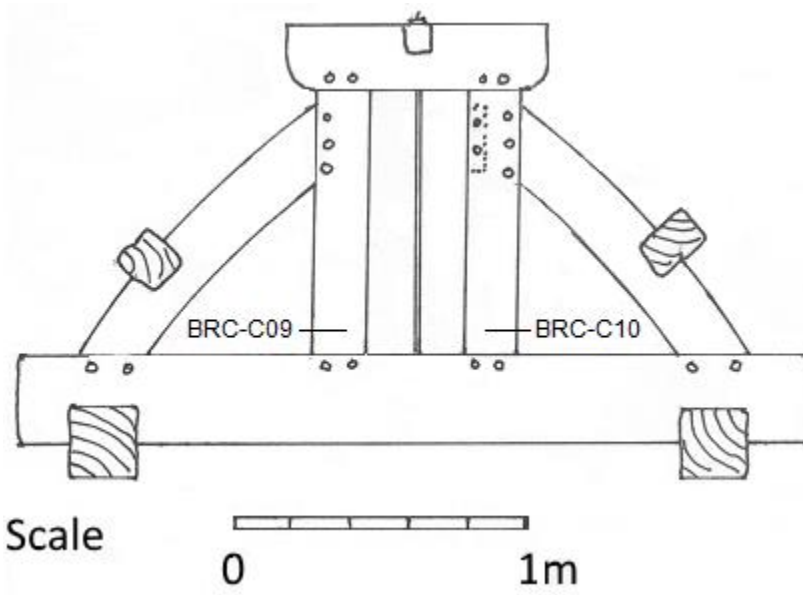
Truss A, showing the location of samples BRC-C09 and BRC-C10
